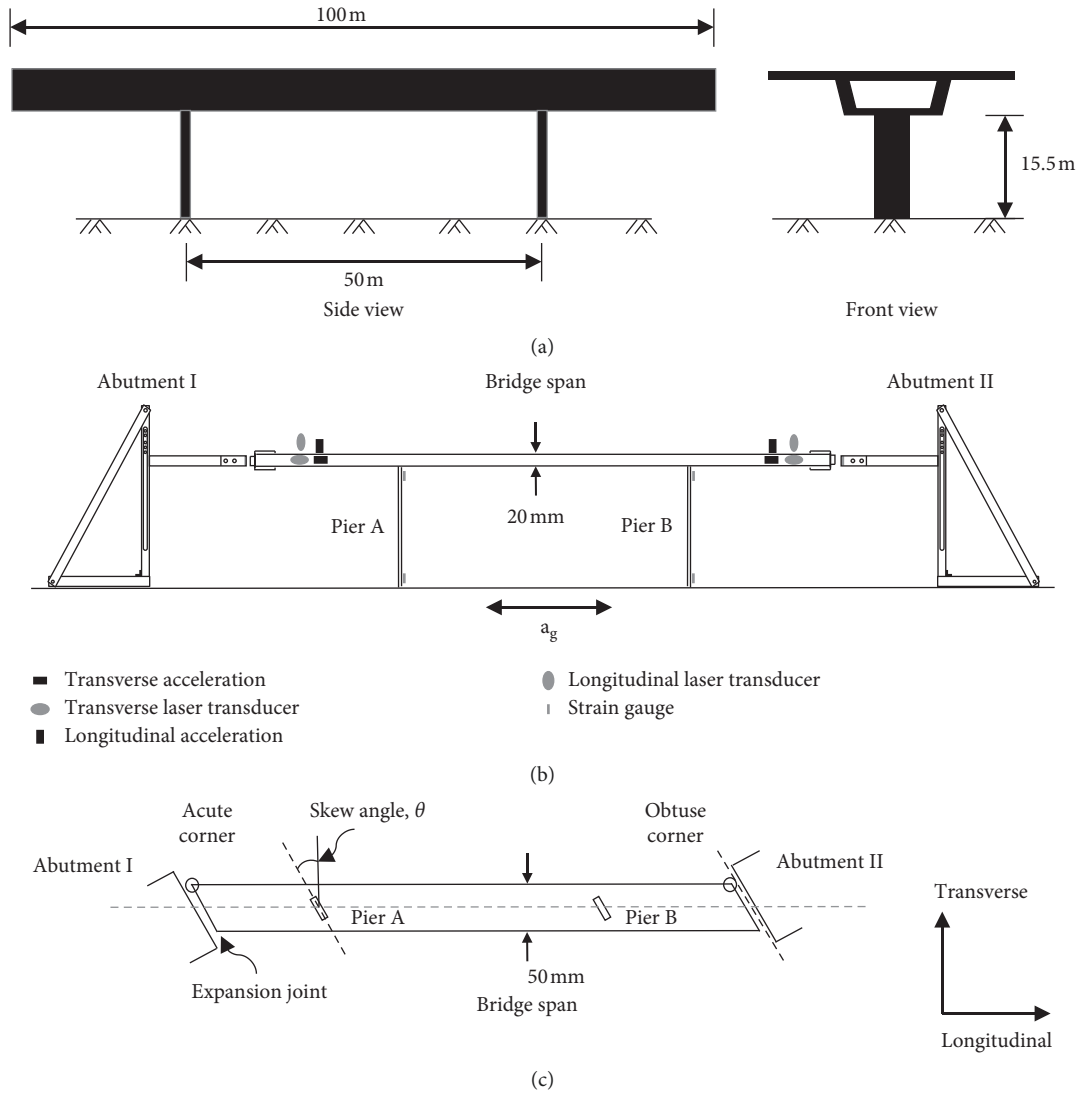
Sketch of the prototype bridge segment (a) and of a bridge-abutment system with sensors: side view (b) and top view (c).
